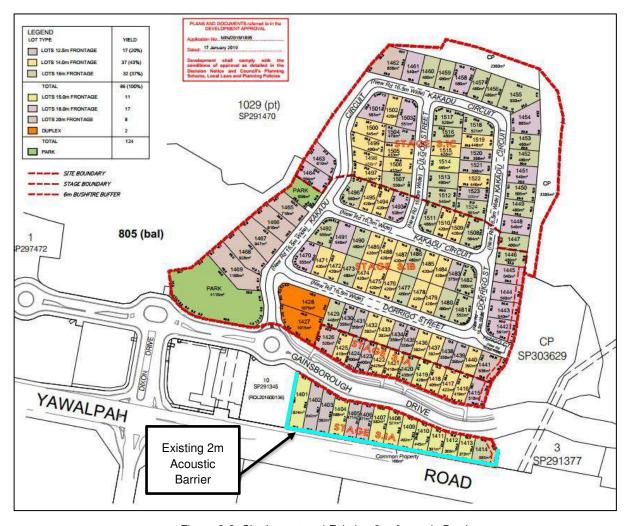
Site Layout and Existing 2m Acoustic Barrier
